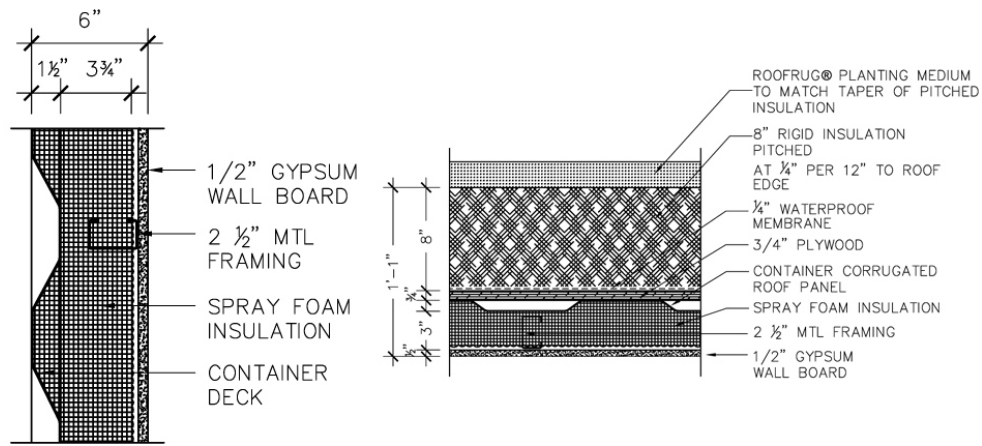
Typical SC wall and roof insulation (RSC 2019)
